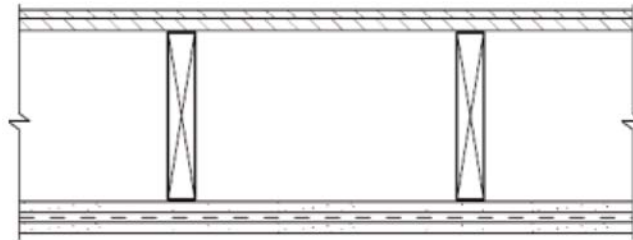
2 hour fire rating using gypsum wall board and resilient channels.
